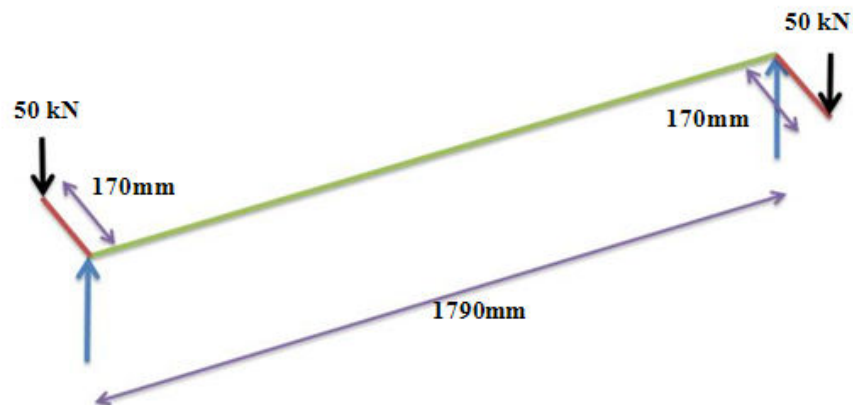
Line Diagram showing Loading and Span of Reference Beam PTR-1.
